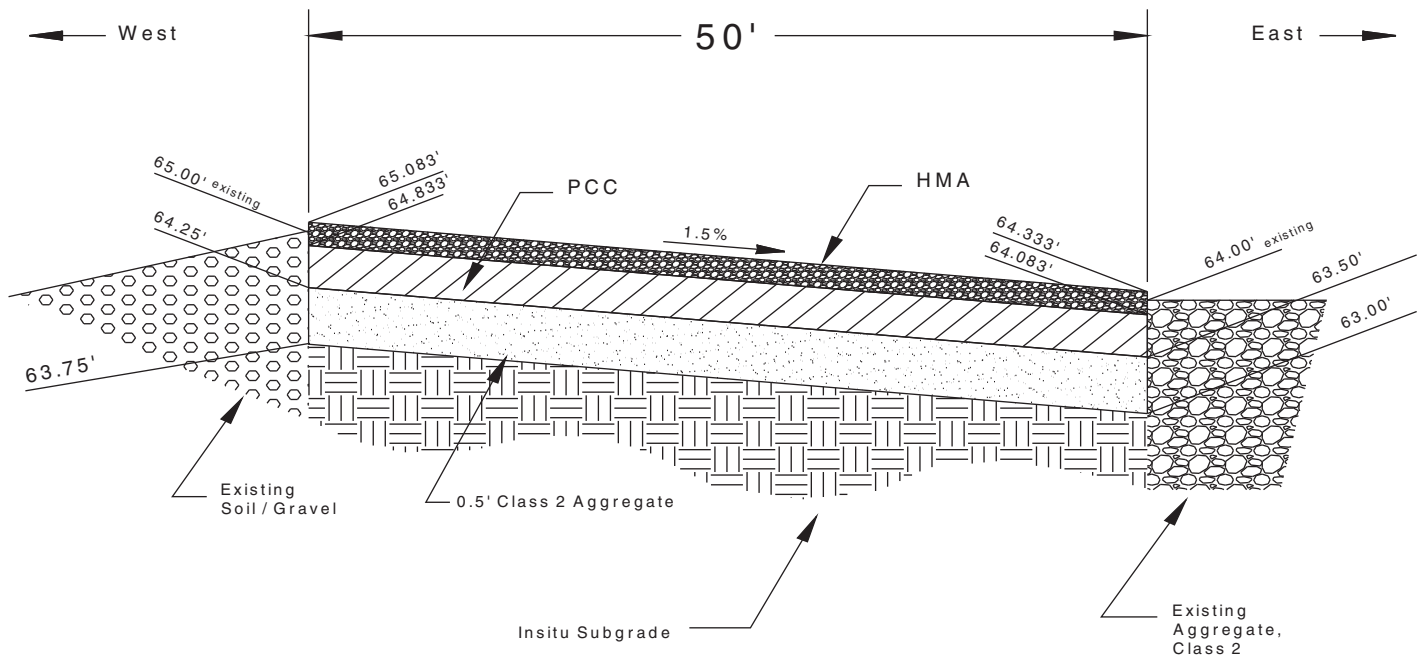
Typical transverse cross section of test track showing elevations and cross-slopes.
